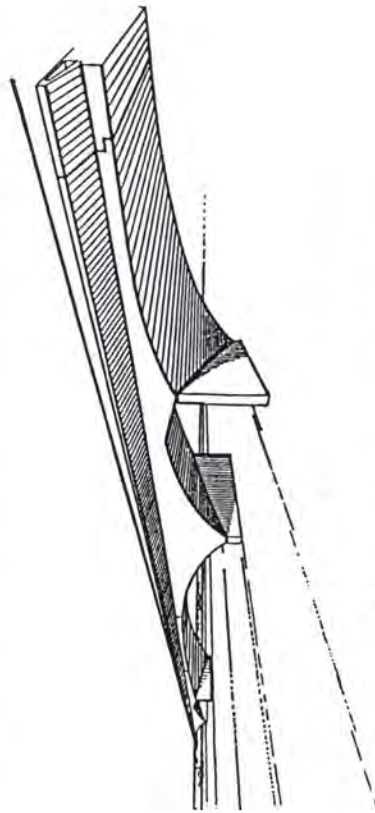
SKETCH DESIGN FOR THE PROPOSED BRIDGE
